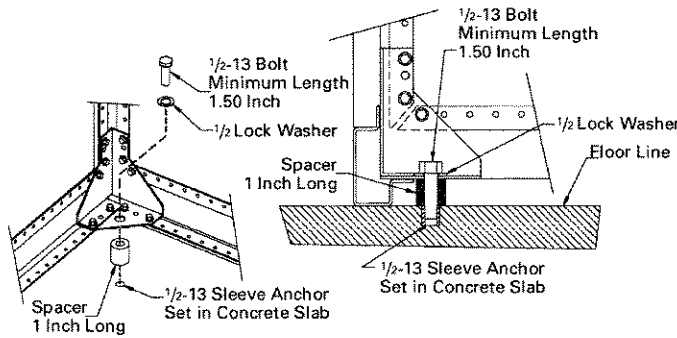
Alternate installation of seismically certified switchboards without floor sills.
